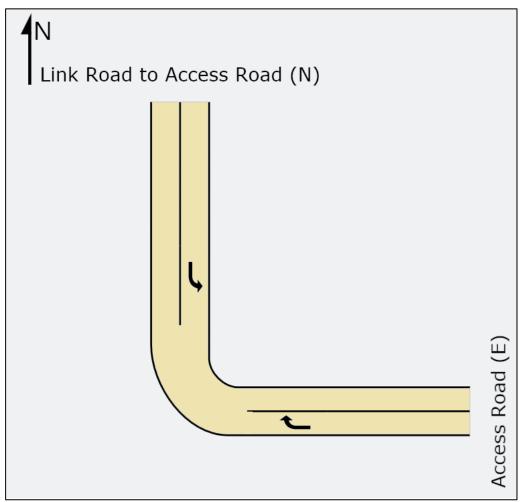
PROPOSED ACCESS ROAD CONFIGURATION
